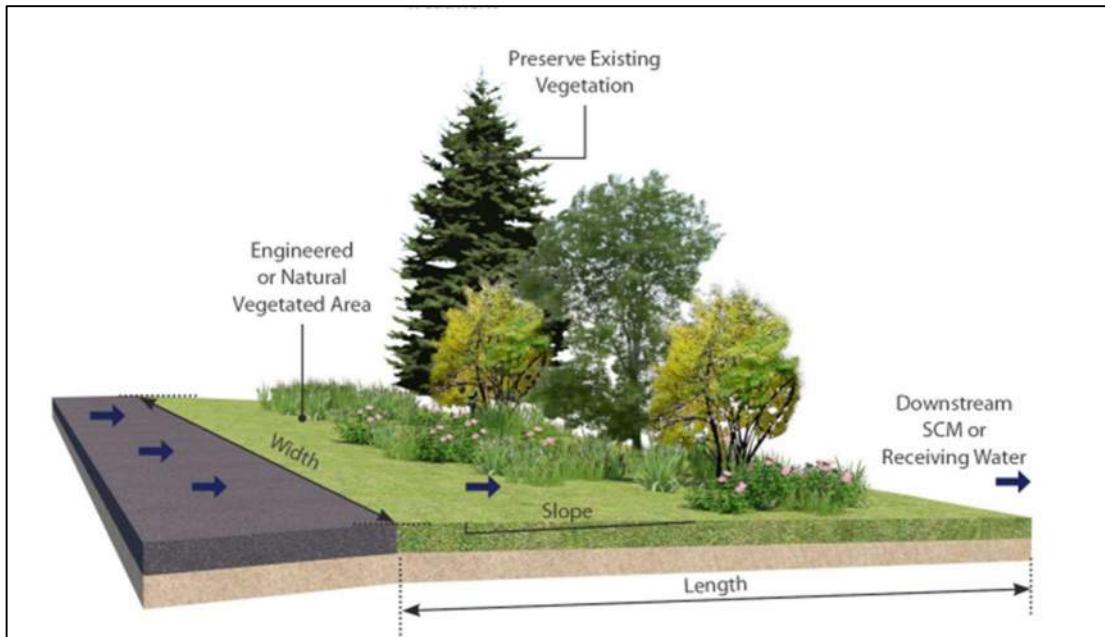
Example of Pavement Disconnection Source: MassDOT Stormwater Design Guide (2023 Ed.)
